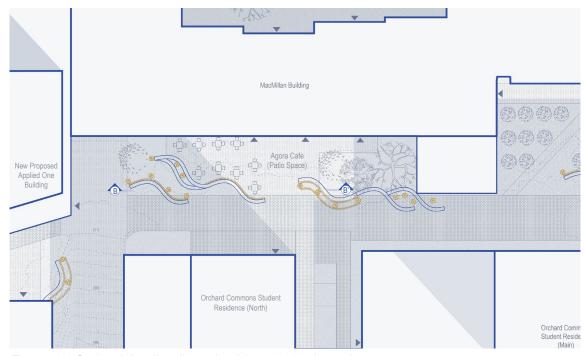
Orchard detail walls and turbines. 2022, by author. (not to scale on a 8.5x11 sheet)
